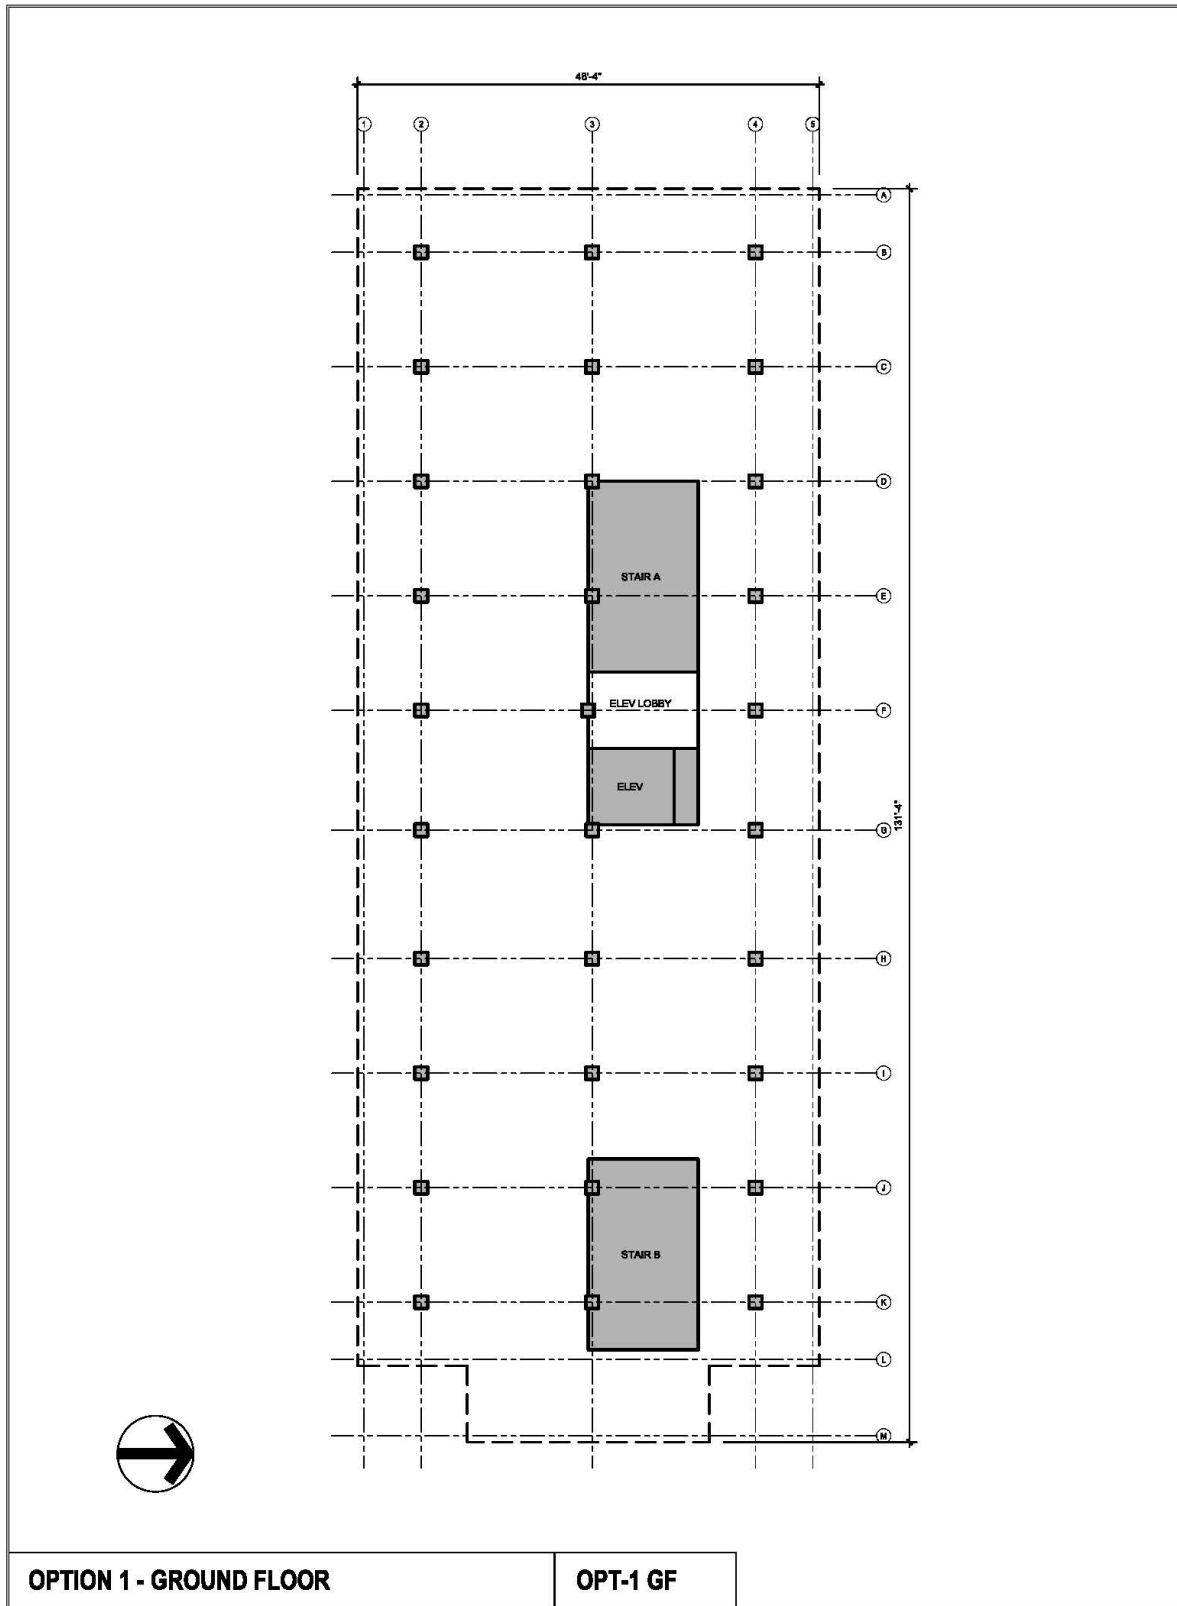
Pre-Design Building Option 1 - Ground Floor
